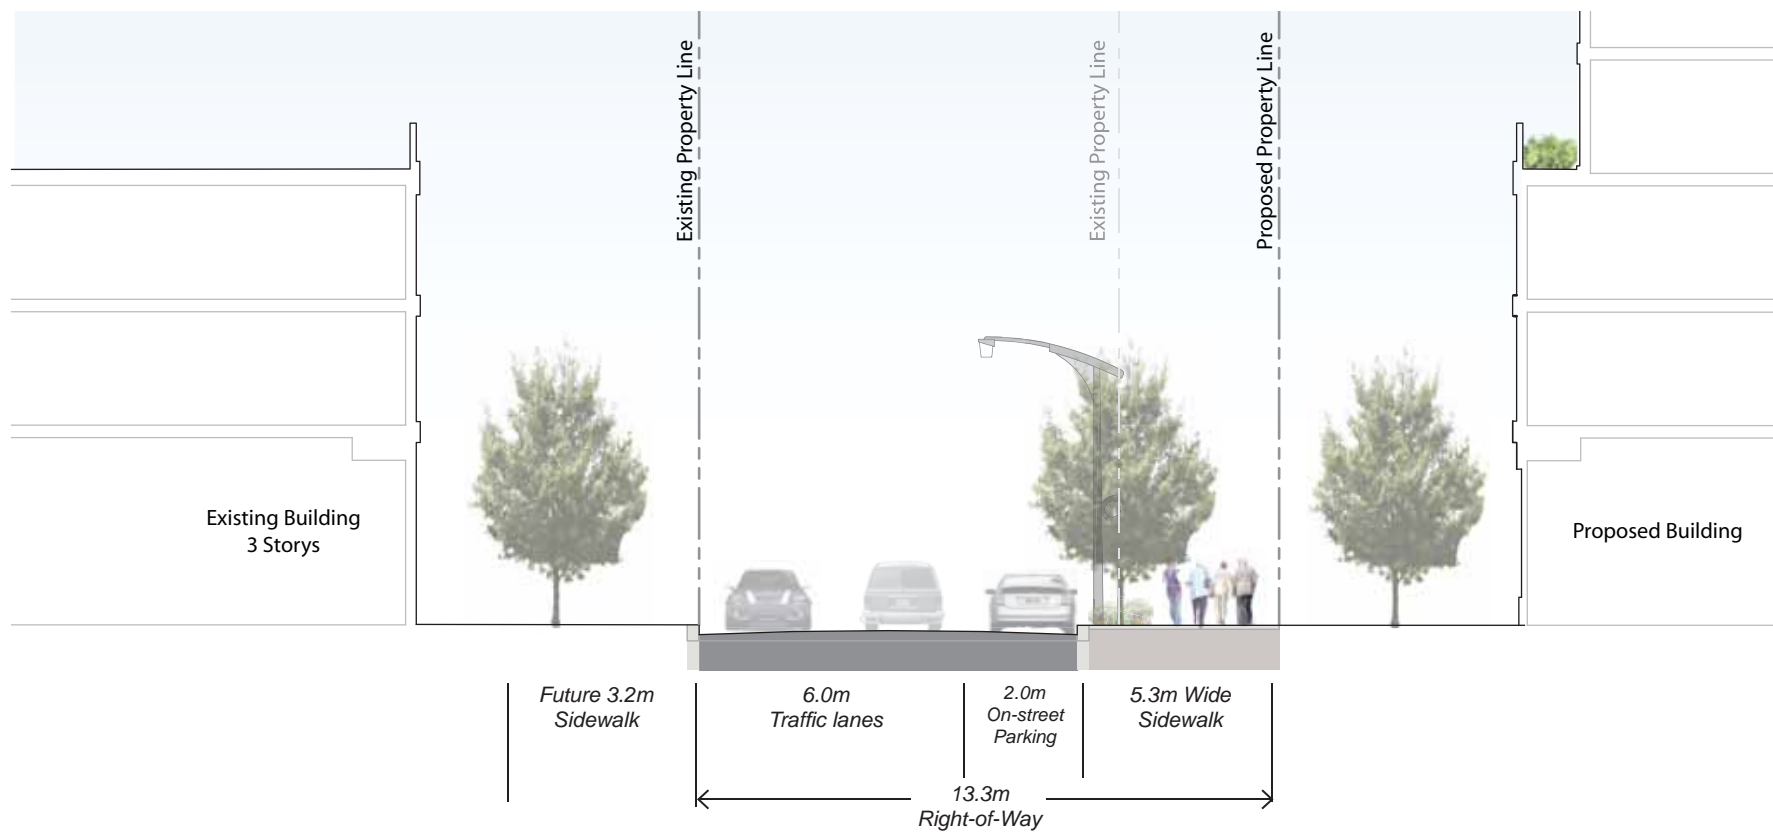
Proposed Upgraded Pell Street Lane Typical Section
